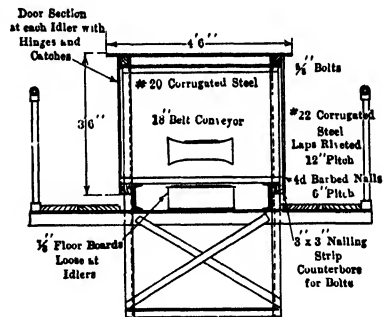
Steel Bridge and Enclosure for Belt Conveyor. Housing Open on the Bottom.
